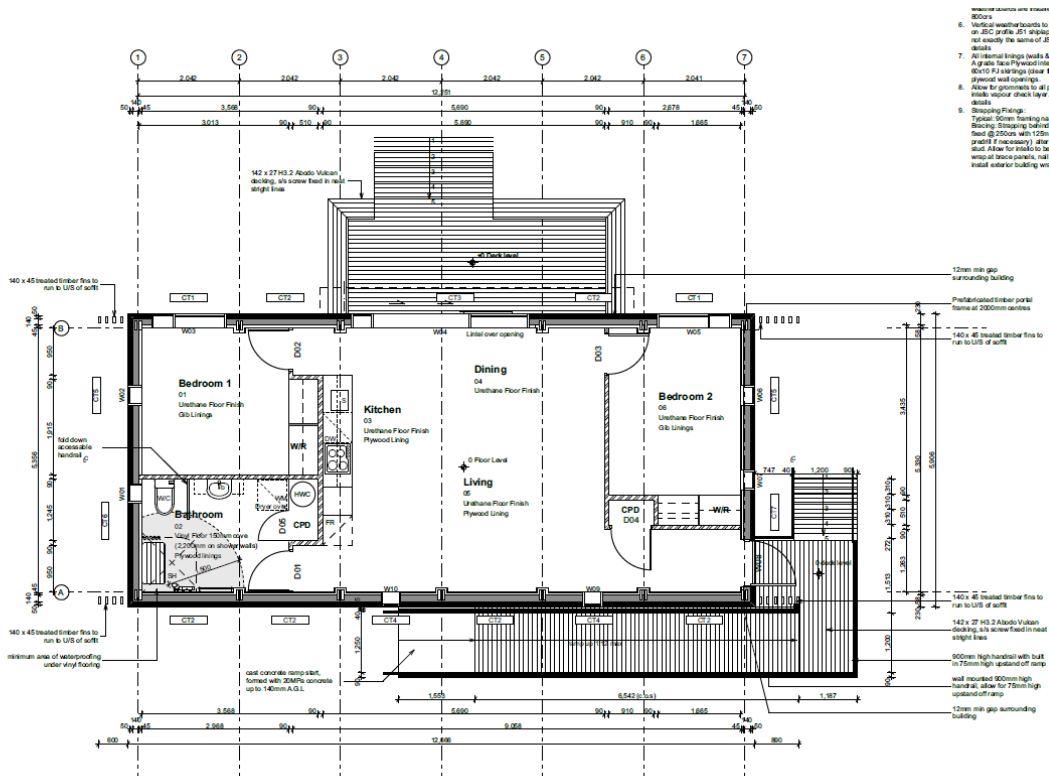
M4 Plan Layout, designed by Darryl Church Architecture
